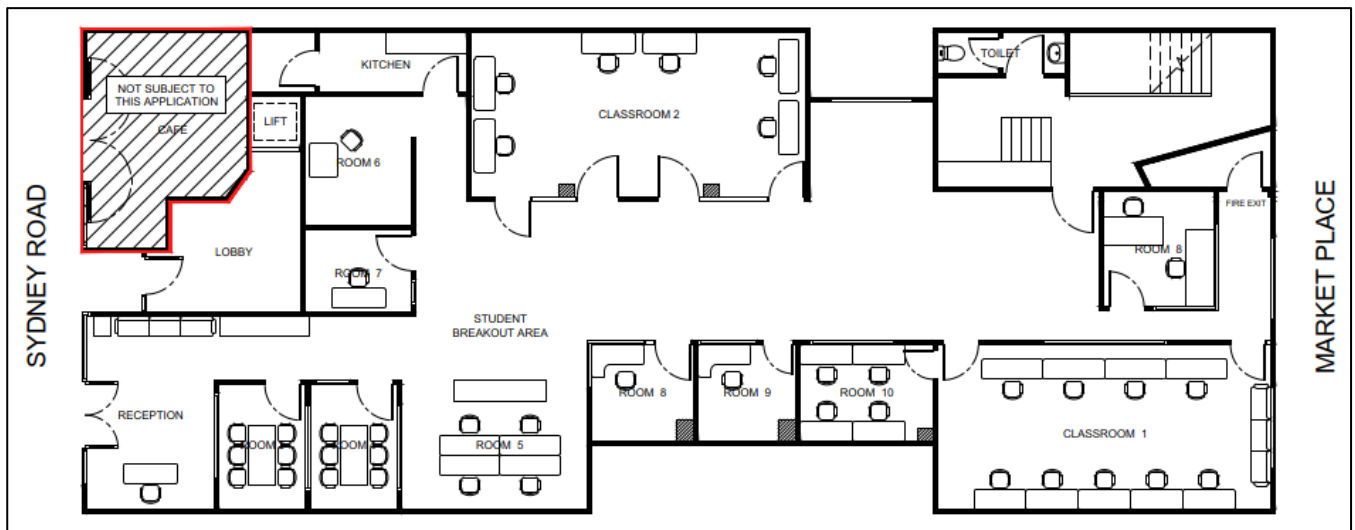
Proposed Ground Floor Plan (ARCHISPECTRUM, 1st of August 2023)
